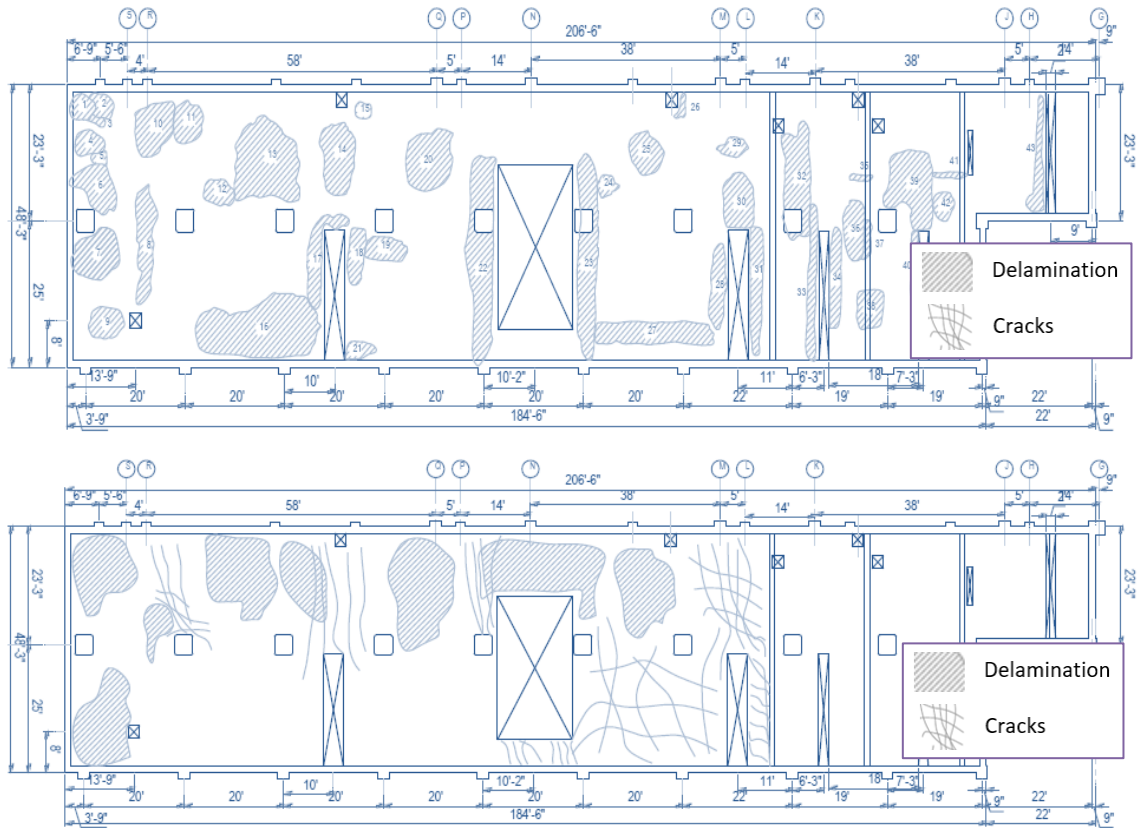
SP6 Deterioration on walls of the sulfur pit
